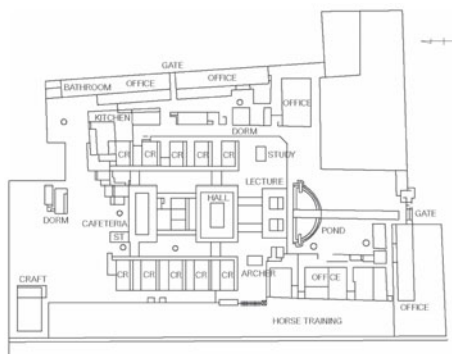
Floor plan of Shizutani Gakko school, Okayama.
